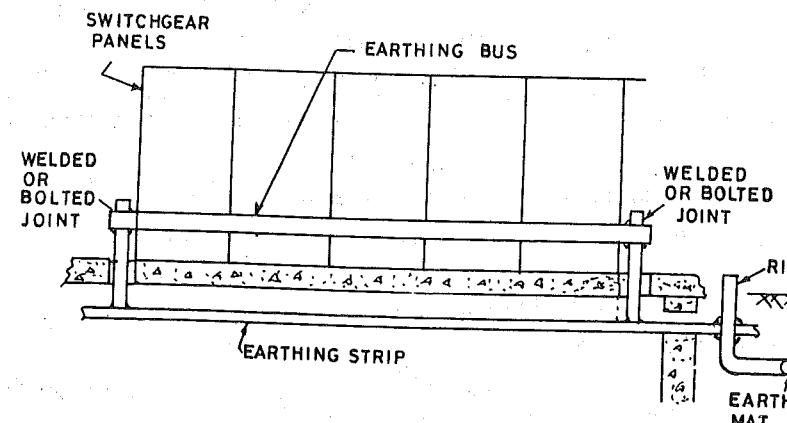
C.4. Equipment Earthing Facility in Metal Clad-Switchgear.
